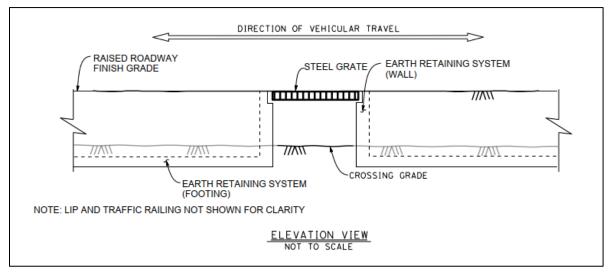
Elevation View of Type 4 Passage Structure on Raised Roadway (not to scale)
